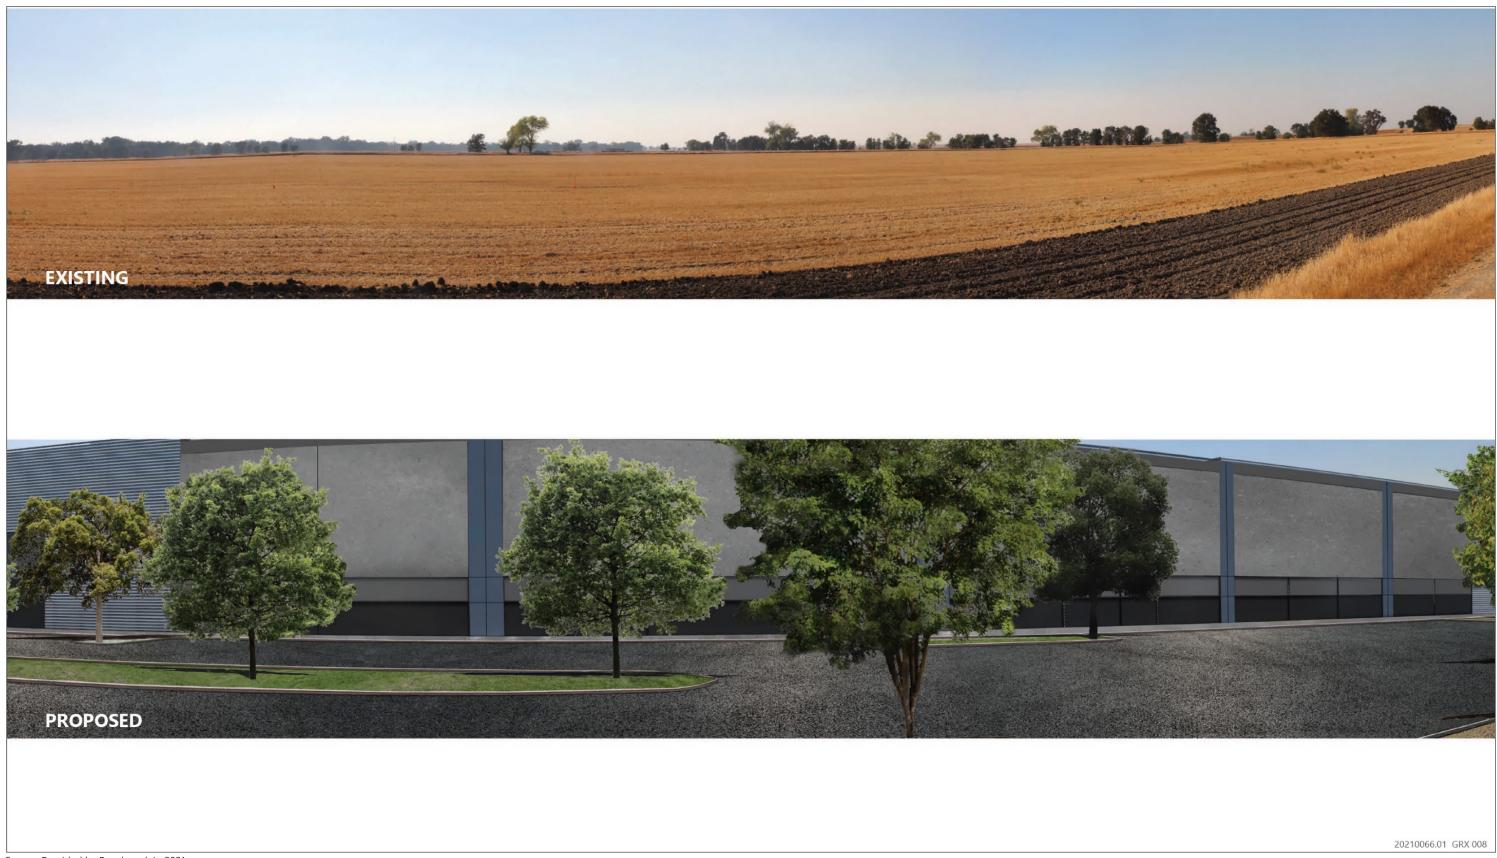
Viewpoint 1 from the Westpark Specific Plan Area Looking North
